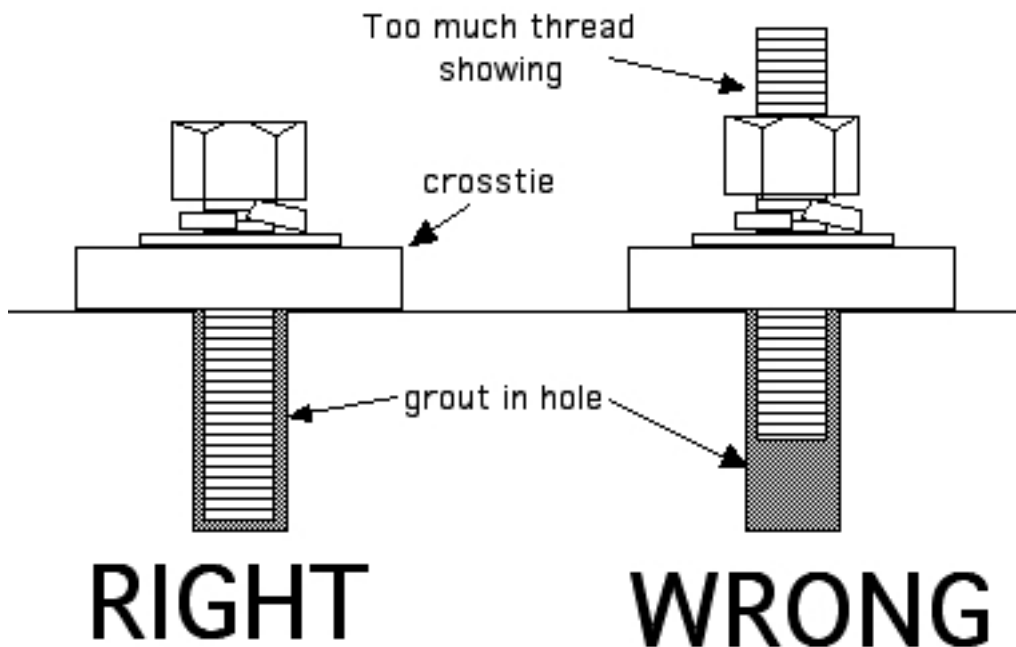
Suspending the Anchor Studs in the Uncured Adhesive.
